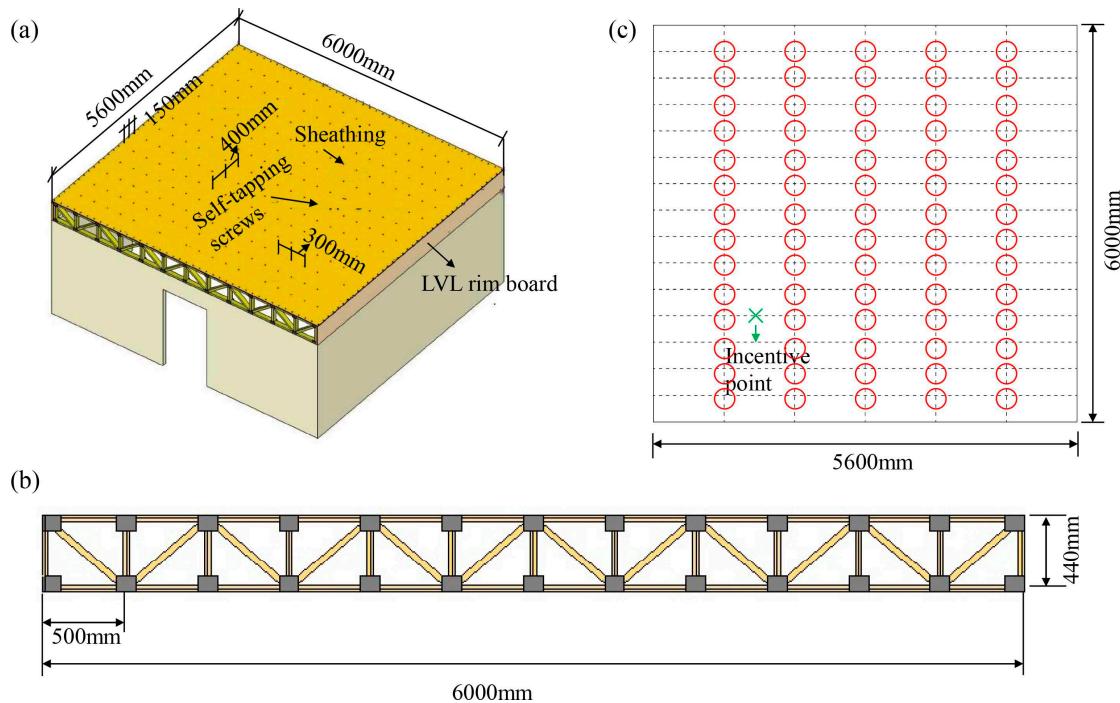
(a) Model of the test floor cover, (b) toothed plate connected parallel to the chord timber combination truss. (c) modal test measurement points.
